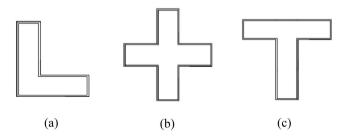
Section forms of closed special-shaped columns 图 3. 闭口截面异形柱截面形式
